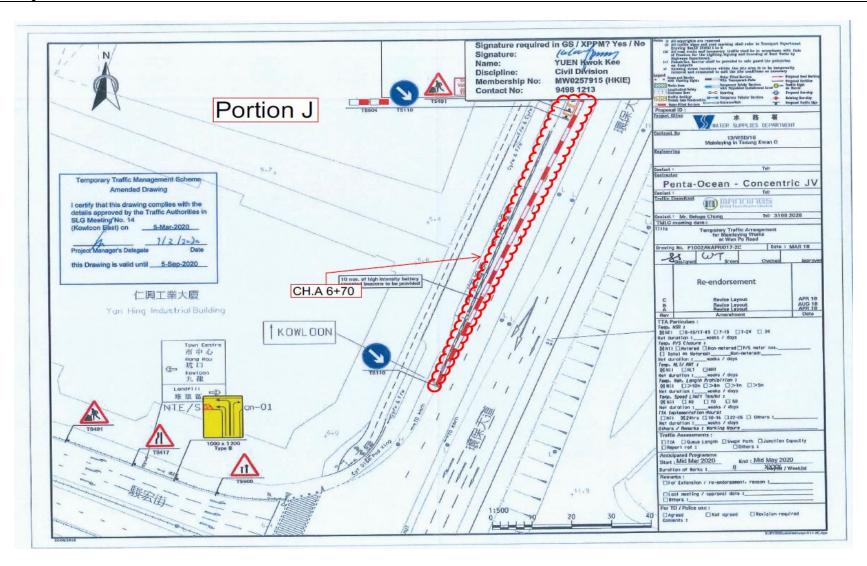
(ii). Location Plan for Portion J - CH.A 6+70
